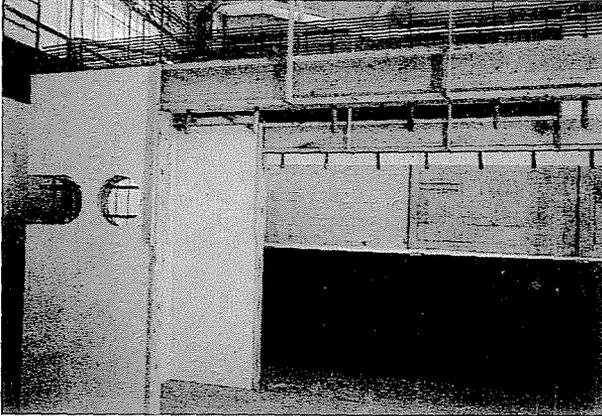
Full-size model unit: stage preceding the assembly of the beam surface elements.
